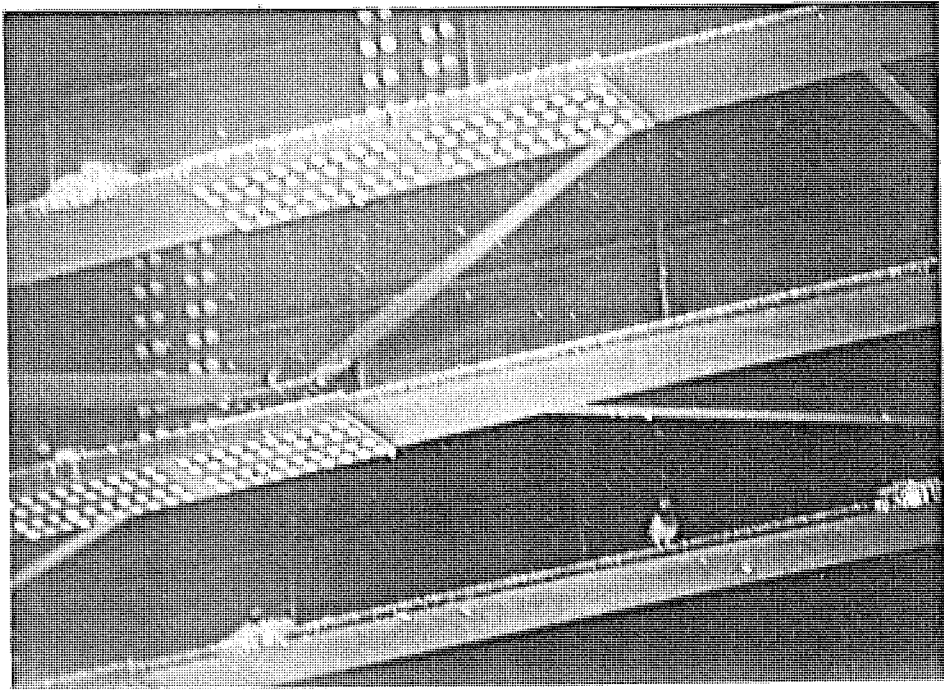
Bird nests on beam flanges of a high level unpainted A588 bridge.
